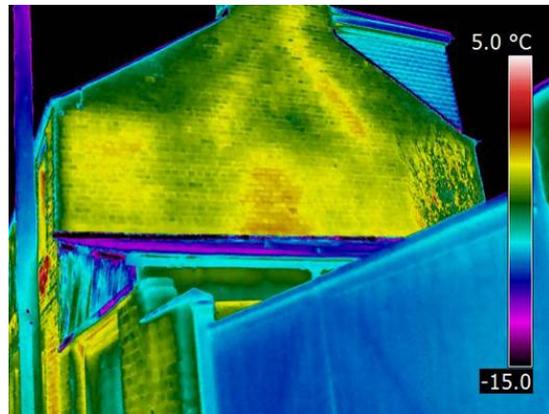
Solid brick wall dwelling with chimney stacks visible, and line of loft insulation present.
